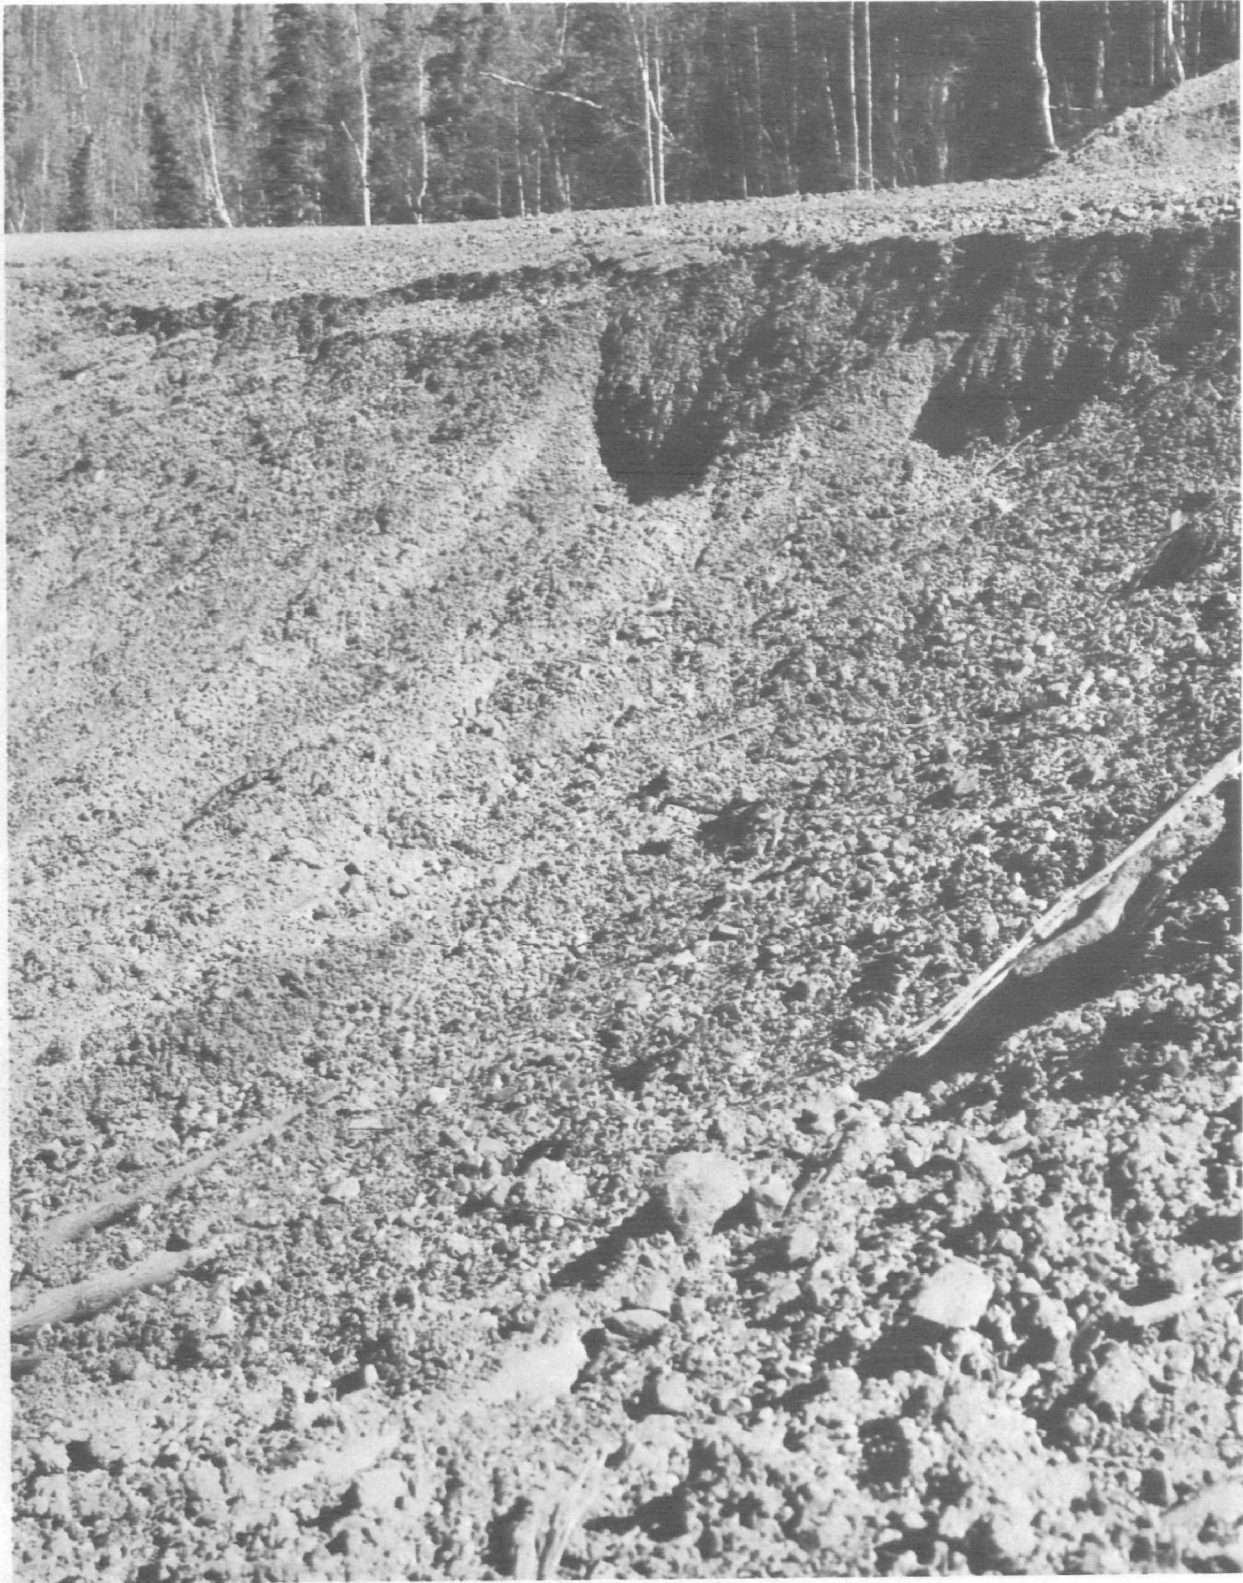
Failure of the fill shown in Figure 9. A small slide is shown which is enlarging, illustrating the oversteep fill because of poor design.
